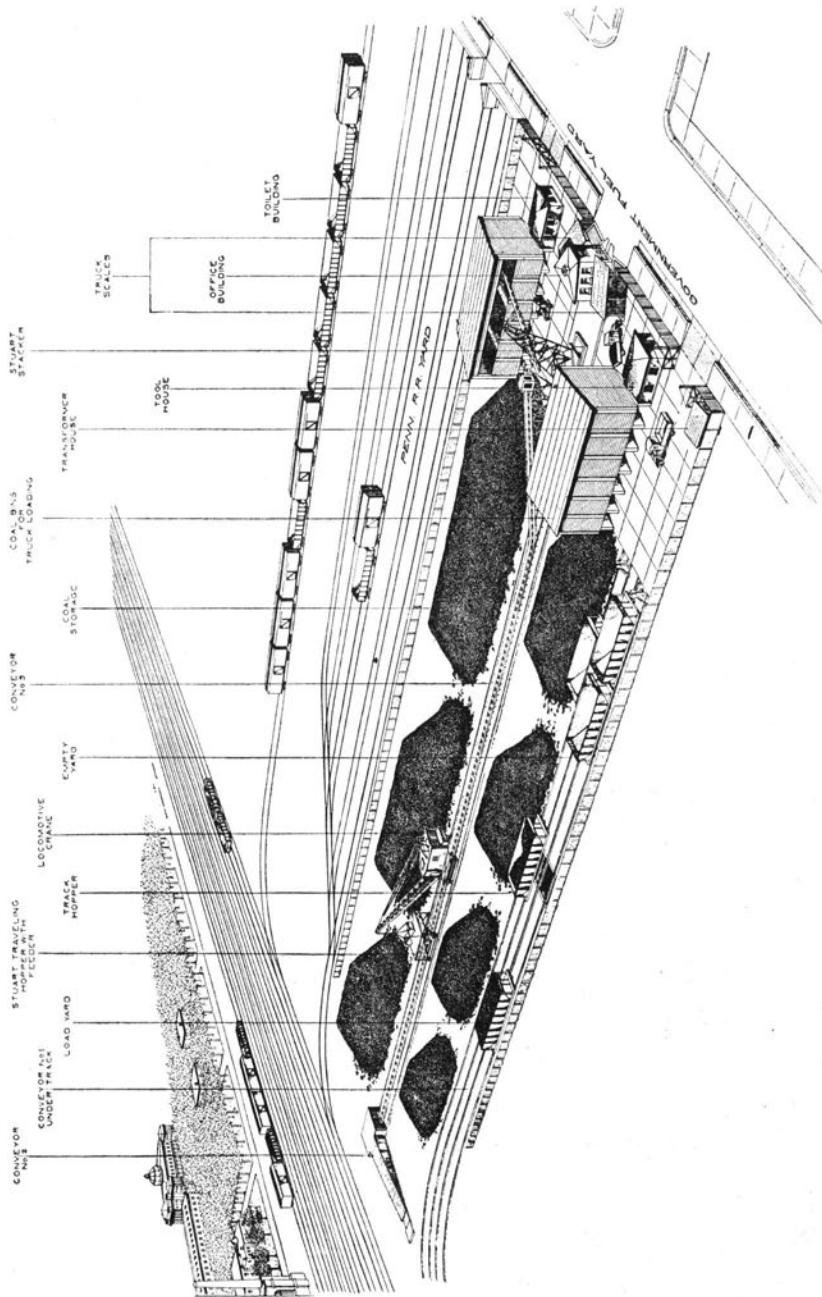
GOVERNMENT COAL STORAGE PLANT, WASHINGTON, D. C. (STUART SYSTEM)
